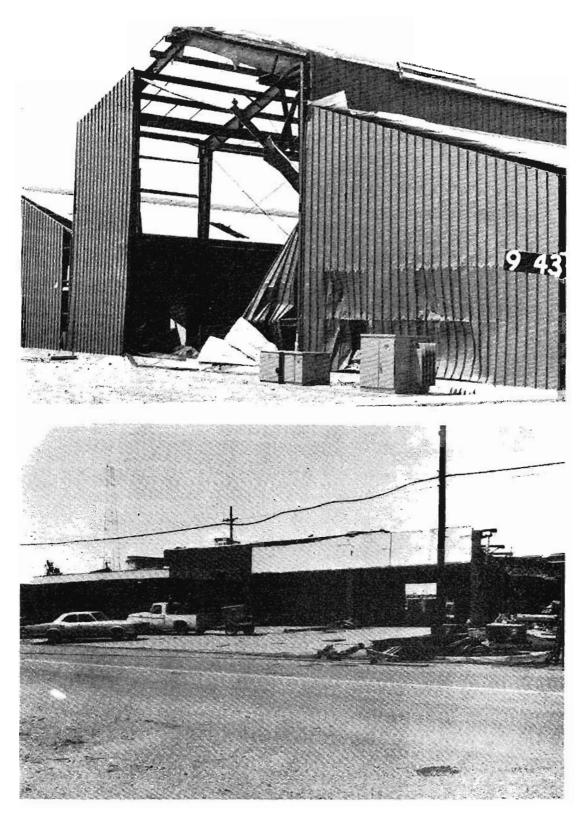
OVERHEAD DOORS OR OPENINGS IN WINDWARD WALLS OFTEN PROVIDE FAILURE INITIATION POINTS. The metal building (top) and Central Fire Station (below) in Lubbock sustained damage because of windward wall failures involving doors.
